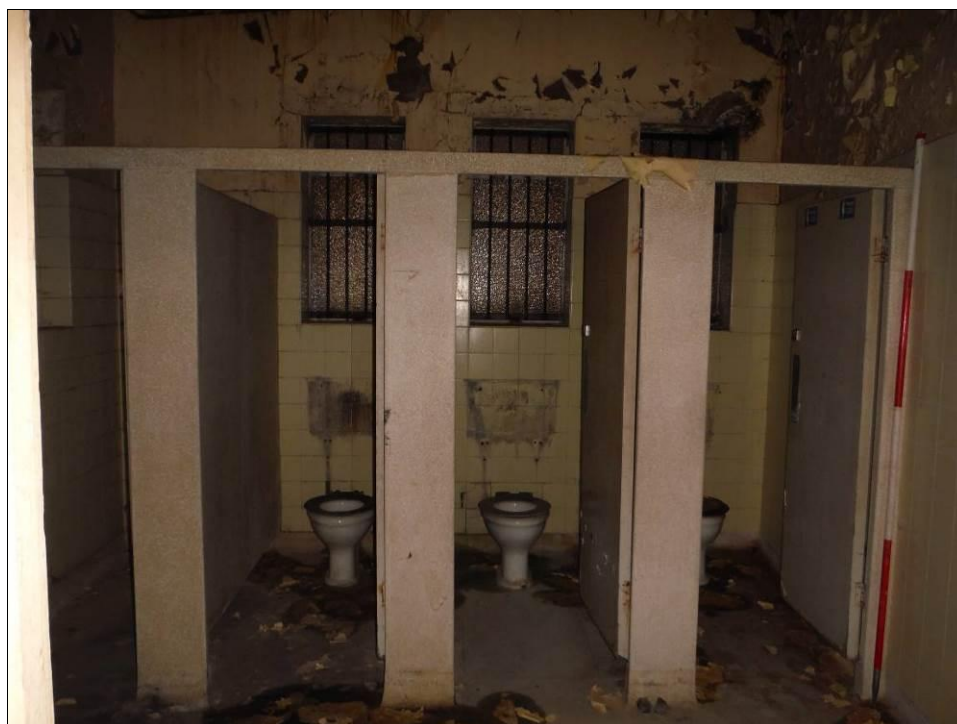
East wall of Room G2, Building B (Scale = 2m).
